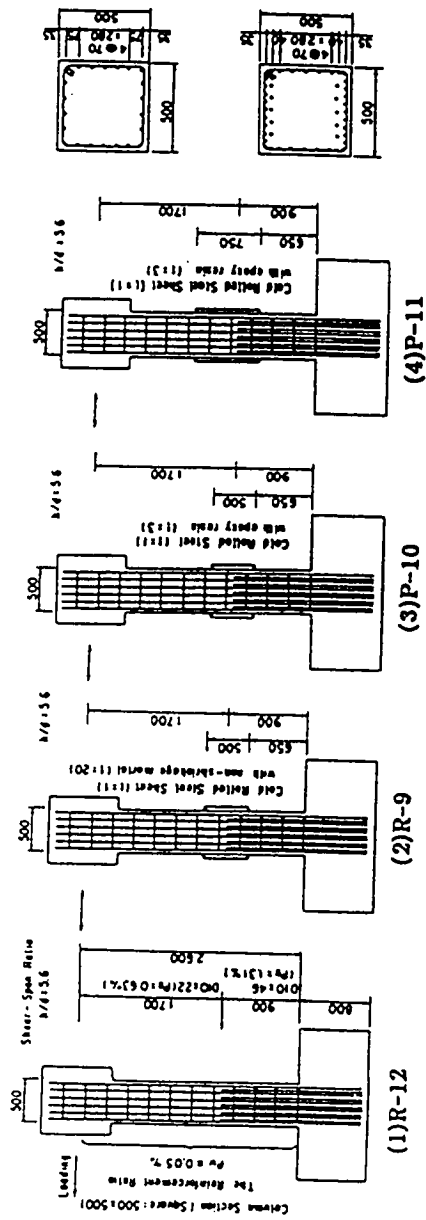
Shear Strengthening of Square Columns by the Use of Steel Jackets, Details of the test Columns, Ref. [24].
